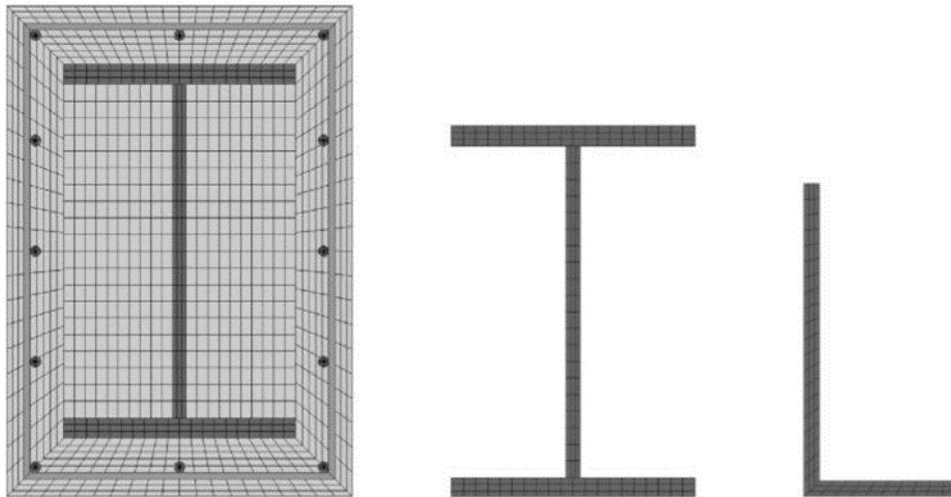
Cross-sectional views of various beam configurations used in high-rise building design.
